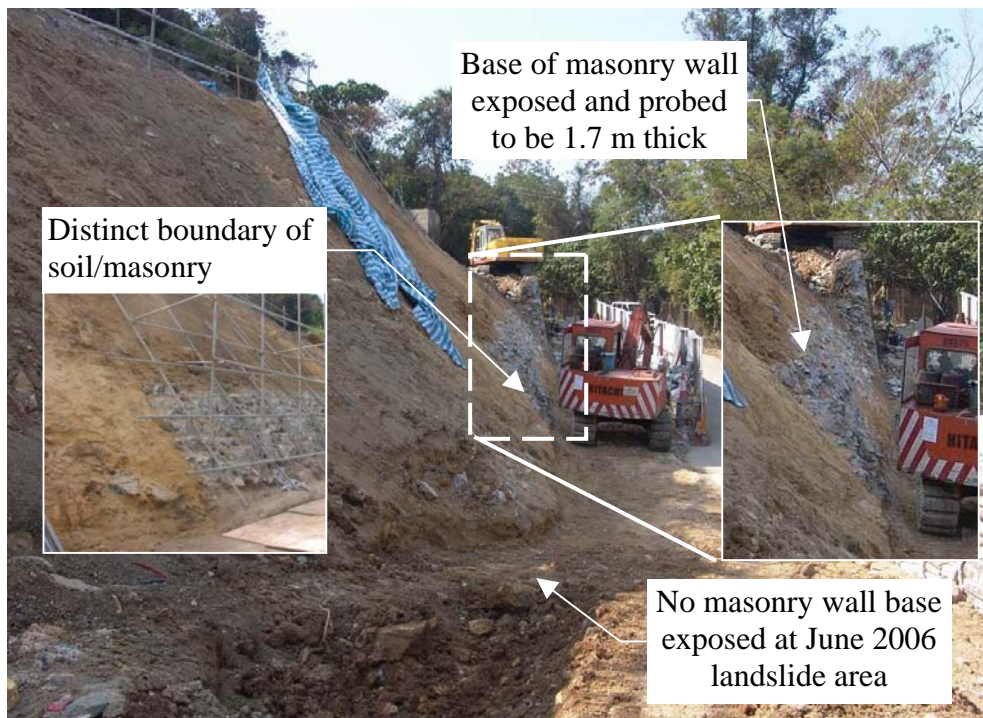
View of the Masonry Wall Base during Wall Demolition
